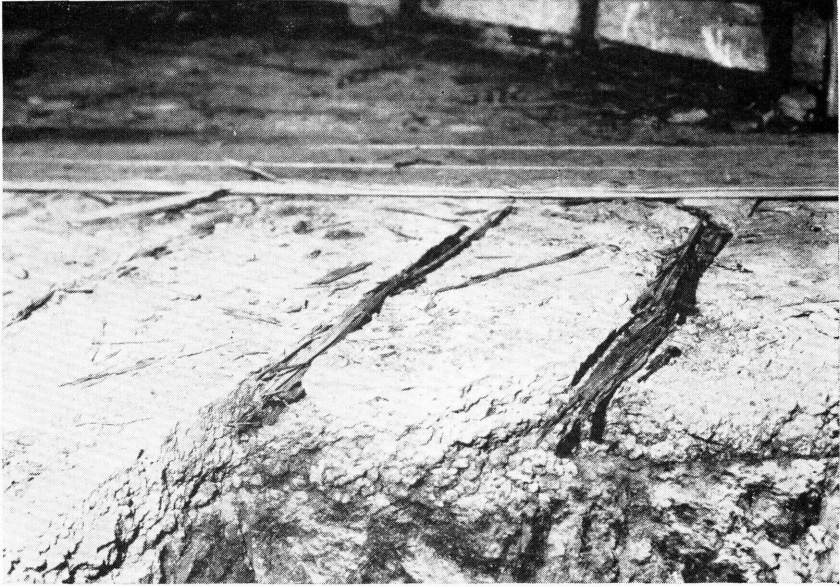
Damage to untreated sleepers embedded in concrete flooring.
